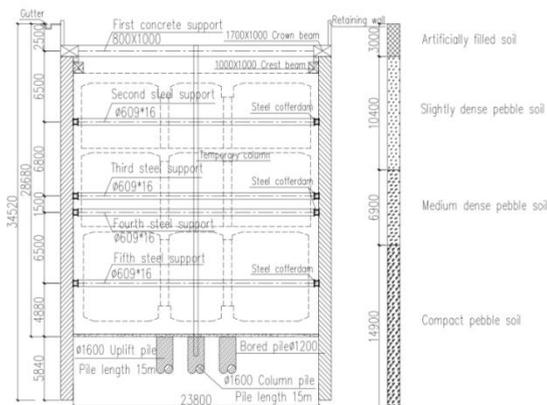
Sectional view of the excavation retaining structure of the subway station.
